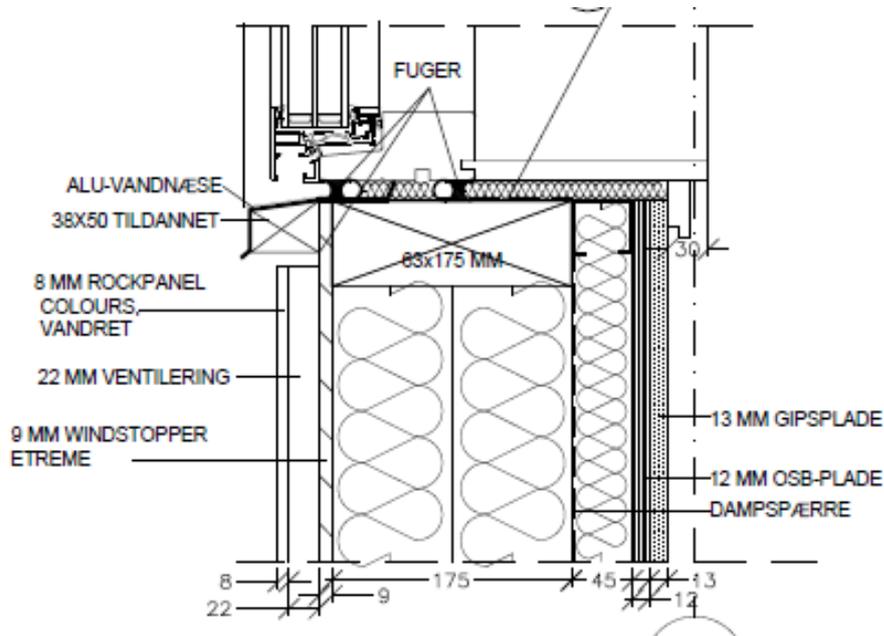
Vertical detail of facade in typical modern multi storey house. The facade consists of 13 mm gypsum board, 12 mm OSB board, 45 mm mineral wool, a vapor barrier, a 175 mm wooden frame filled with mineral wool. On the outside a sealed fibre cement based wind stopper, a ventilated gap and a cladding of compressed mineral wool boards.
